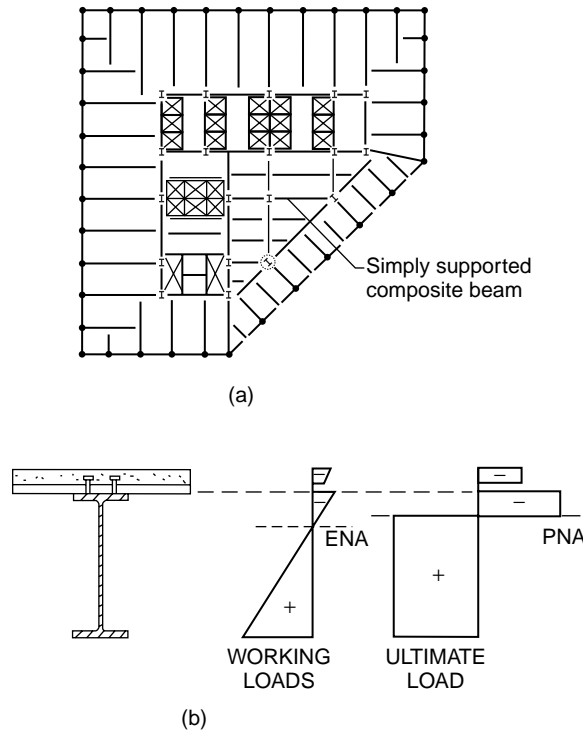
(a) Composite floor plan. (b) Stress distribution in a composite cross section.
